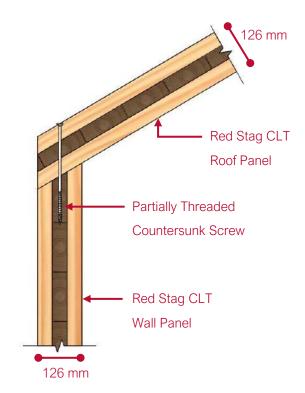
Red Stag three (3) layer CLT roof panel to CLT wall panel connection.
